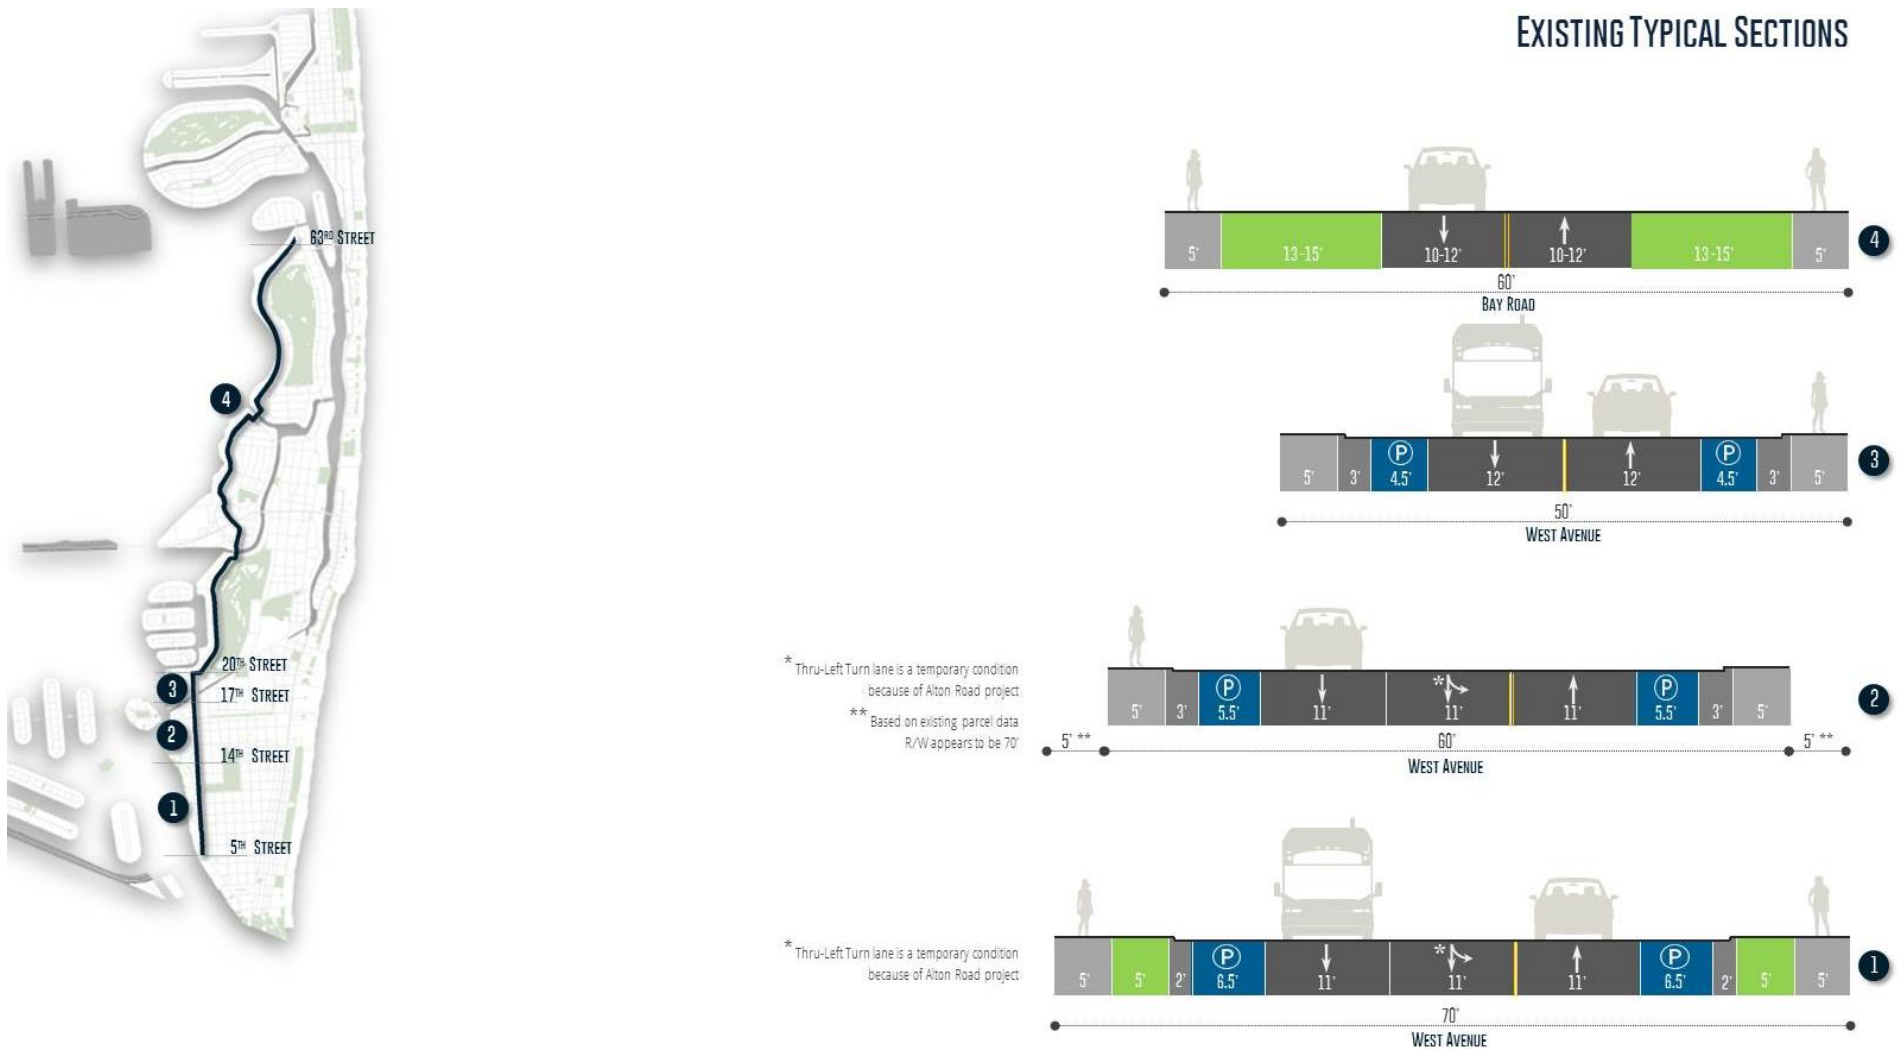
West Avenue – North Bay Road Corridor Segments and Existing Typical Sections
